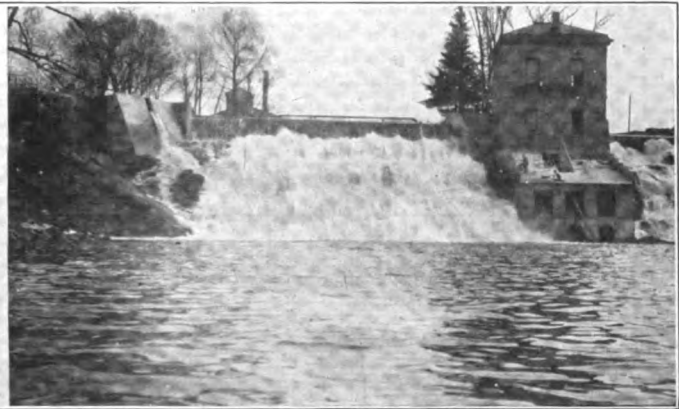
Completed Dam and Forebays and New Pump Room Under Construction
